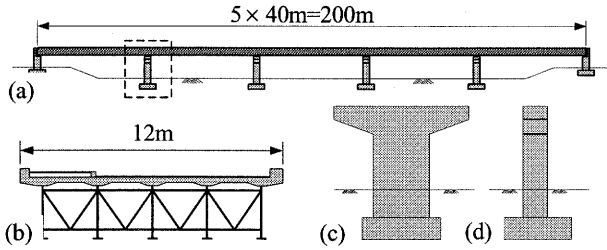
A continuous elevated highway bridge (a) elevation, (b) lateral view of superstructure, (c) lateral view of column, and (d) side view of column.
